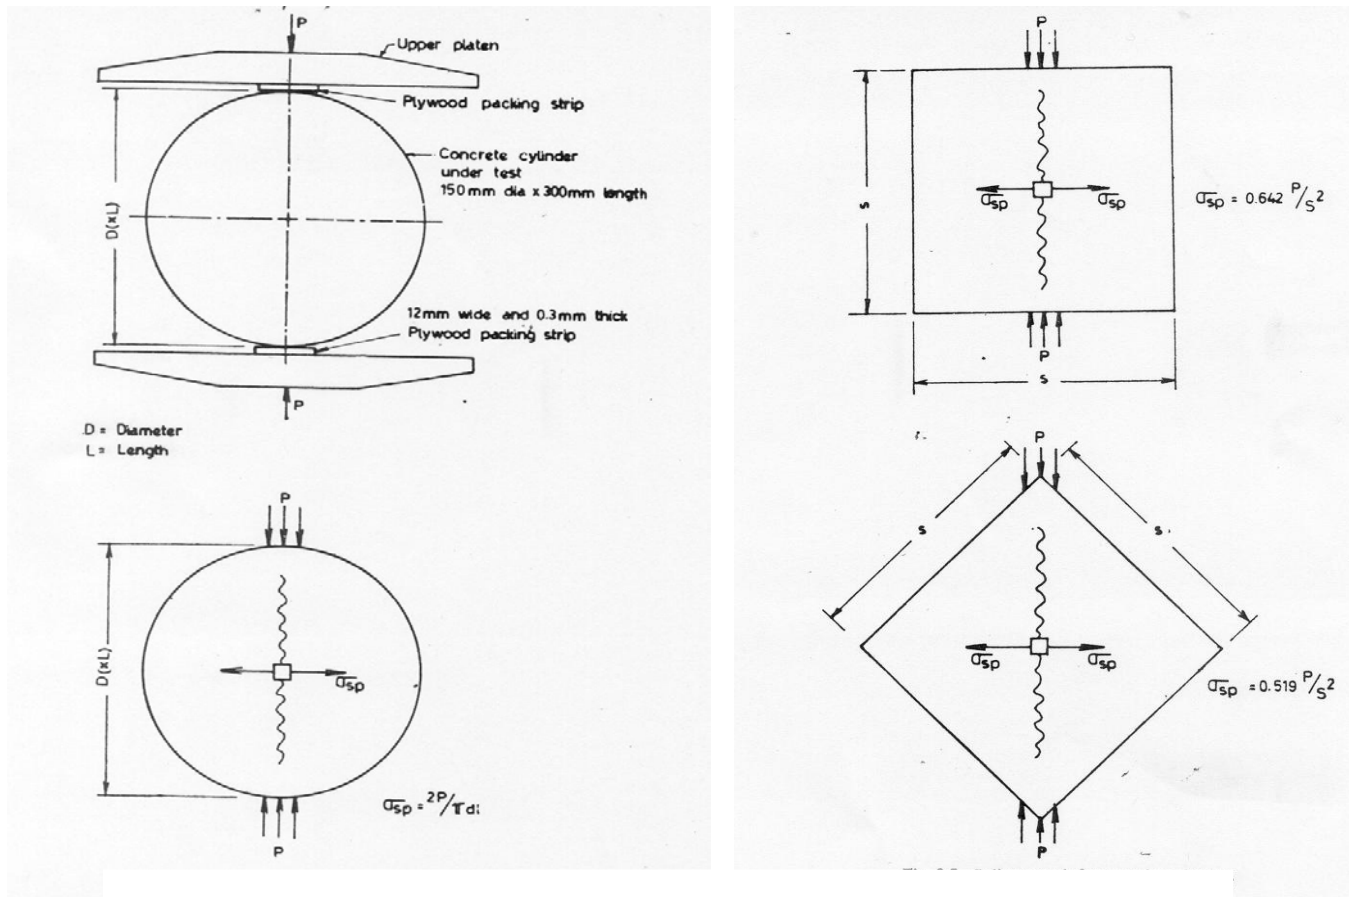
Loading arrangement of cylindrical and cubic specimens for split strength determination
